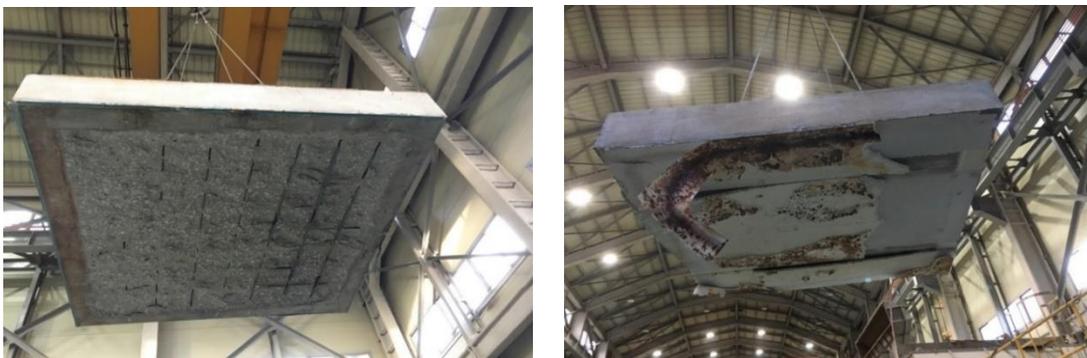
Spalling of RC Slab for RWS : Reference(L) and Fire-protected(R)
